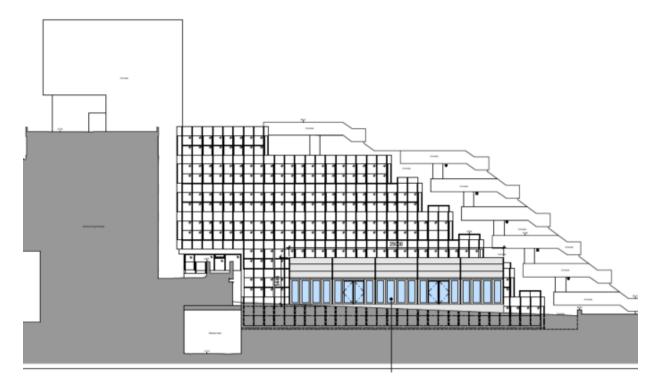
Proposed Northwest elevation (Prepared by Mace)
